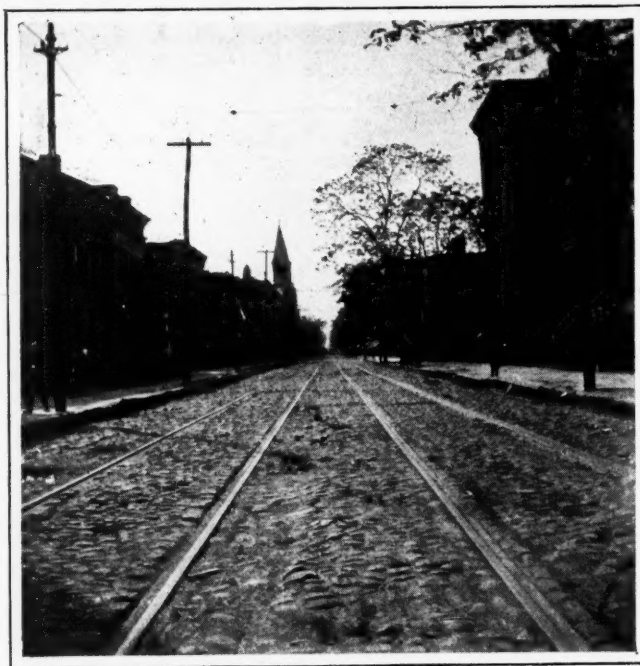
TYPICAL COBBLE PAVEMENT—STREET CAR TRACKS SHOWN
